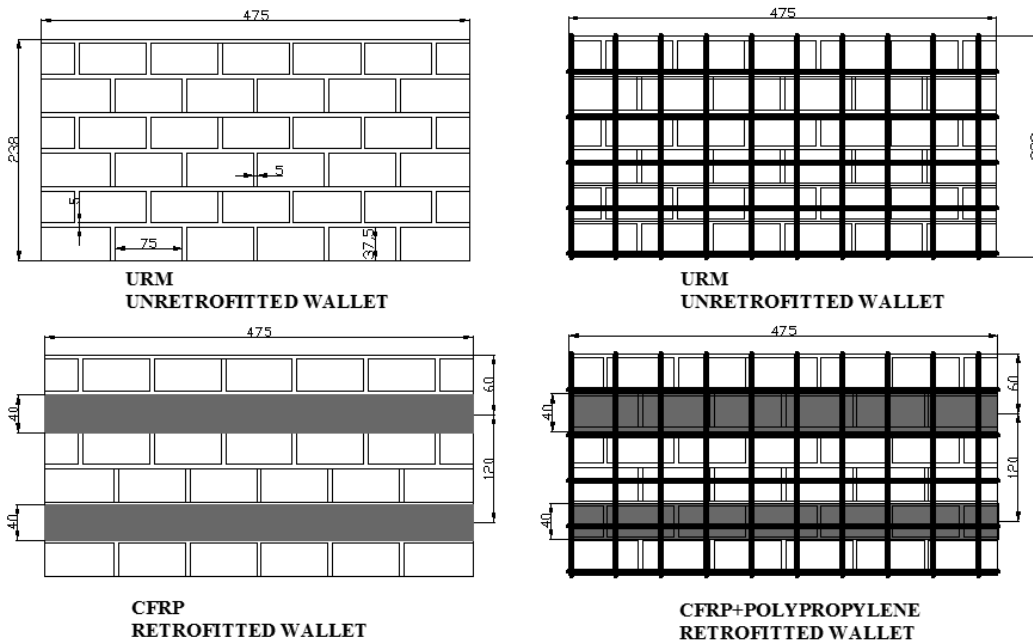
Masonry wallets retrofitting scheme for out of plane load test.
